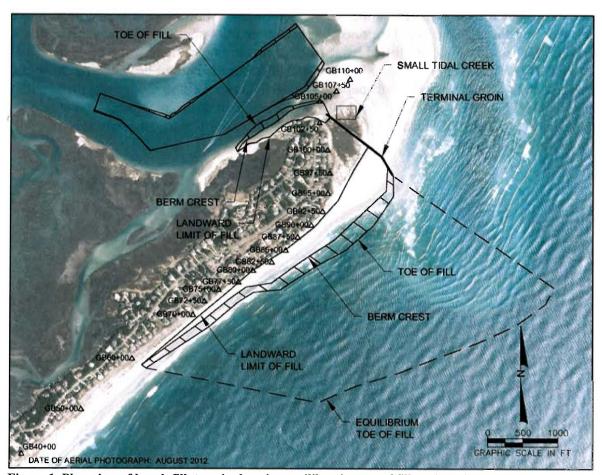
Plan view of beach fill, terminal groin, equilibration toe of fill, and navigation channel.
